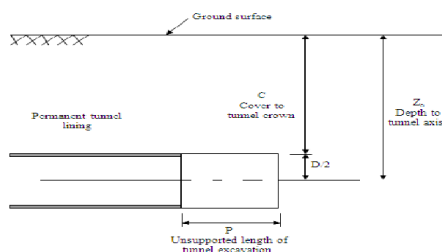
Geometric parameters of a tunnel heading for calculation of stability number at collapse
